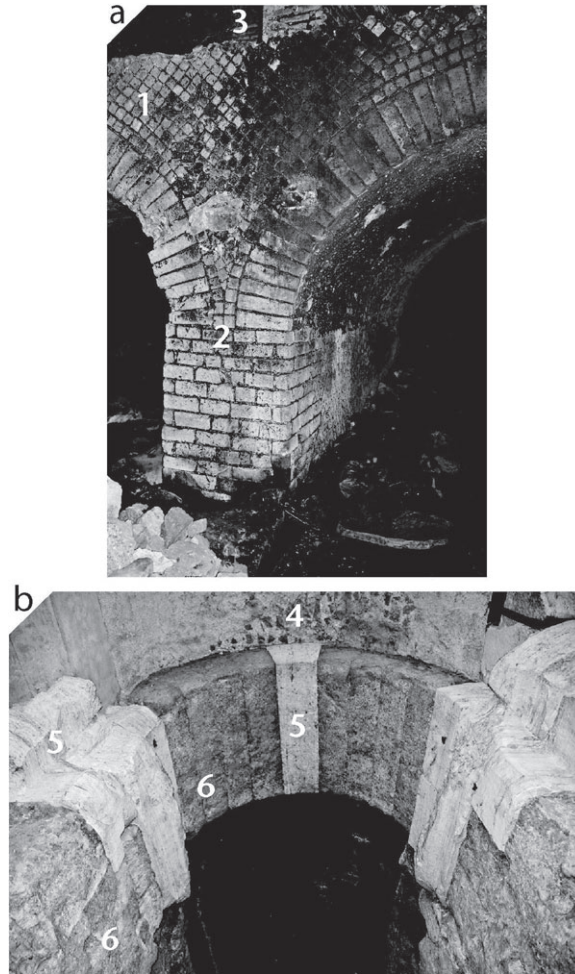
Photographs of the concrete and stone masonry of the Theatre of Marcellus: (a) concrete walls, with facings of Tufo Lionato opus reticulatum (1) and small rectangular blocks (2), and brick opus testaceum overhead (3); (b) a concrete barrel vault with Tufo Lionato caementa (4), adjacent to a Tufo Lionato cut stone barrel vault (5) reinforced with travertine (6).
